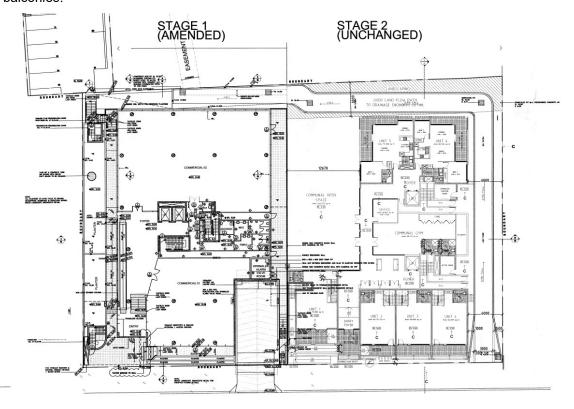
Approved development at 25-27 Atchison Street under DA-2004/2281 (as modified). This ground floor plan shows the location of the drainage channel along the southern side of 27 Atchison Street and running north-south at the rear of the subject site.
